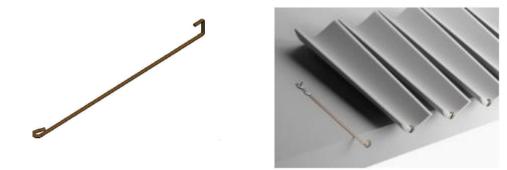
Underlayment pitch-to-bottom bent tile hook for roof covering system without supporting battens
